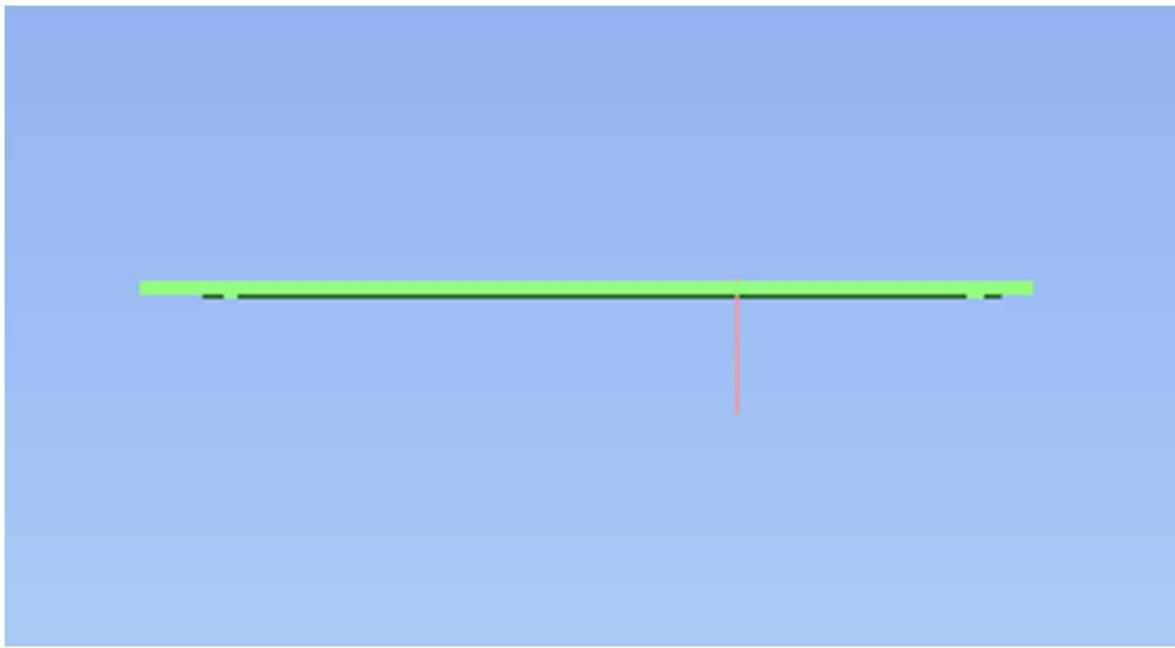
Low Clash of Curtain-wall steel frame (Element ID 30027) vs Concrete slab (Element ID 41112) – Back View
